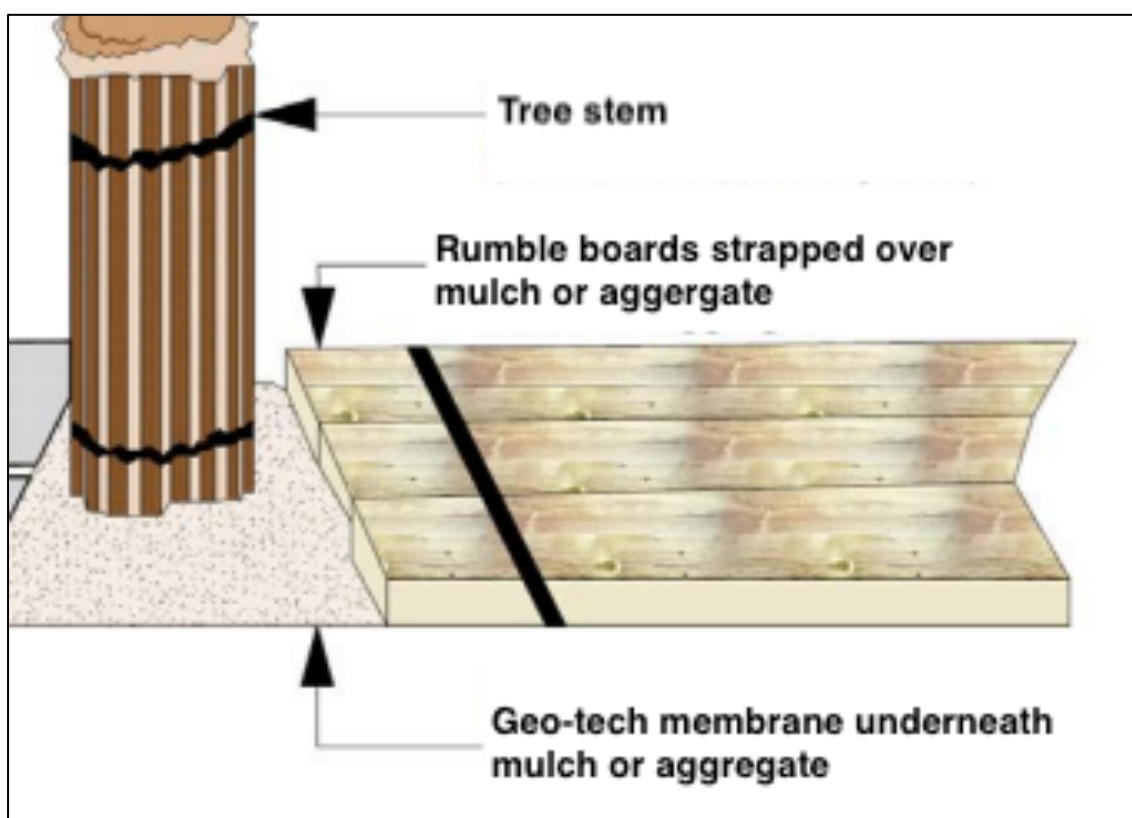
TPZ root protection guidelines (Modified AS 2470-2009).
